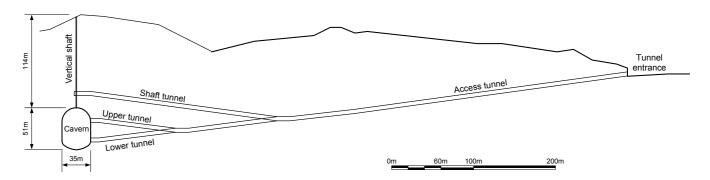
Layout of storage cavern and access tunnels at the LRC Demo Plant
